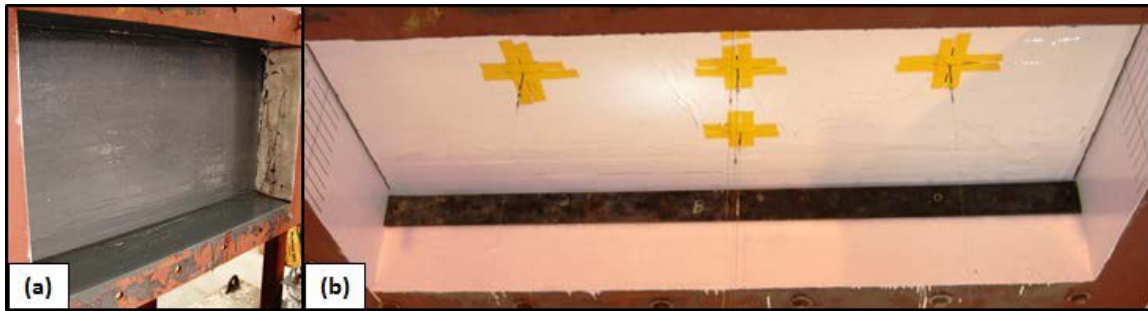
SW11. (a) Wall retrofitted with trowel-on epoxy. (b) Epoxy painted white so cracks could be seen during deformation.
